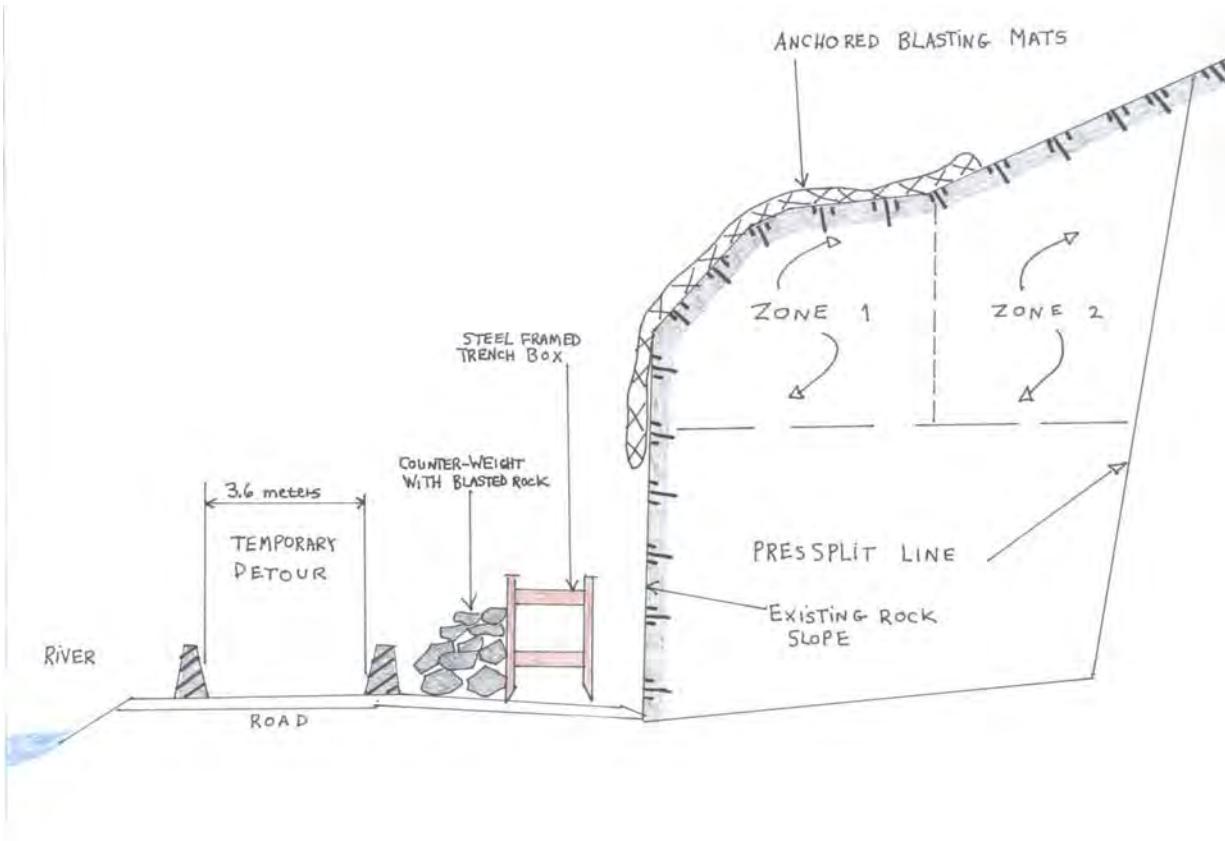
The rock slope was pre-split in one lift and excavated with small production shots in two lifts
